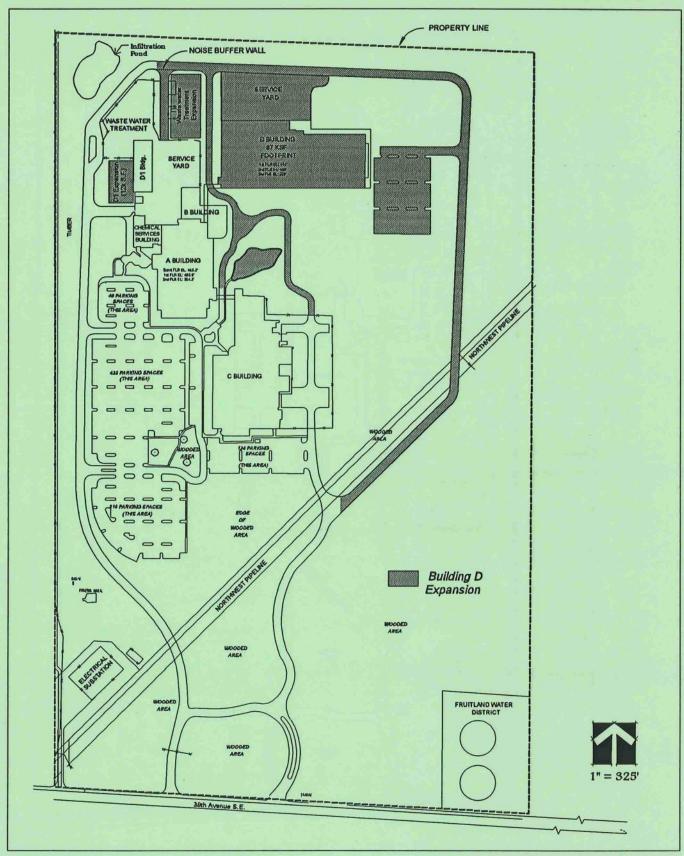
Proposed Expansion Site Plan SAMPLING PLAN
